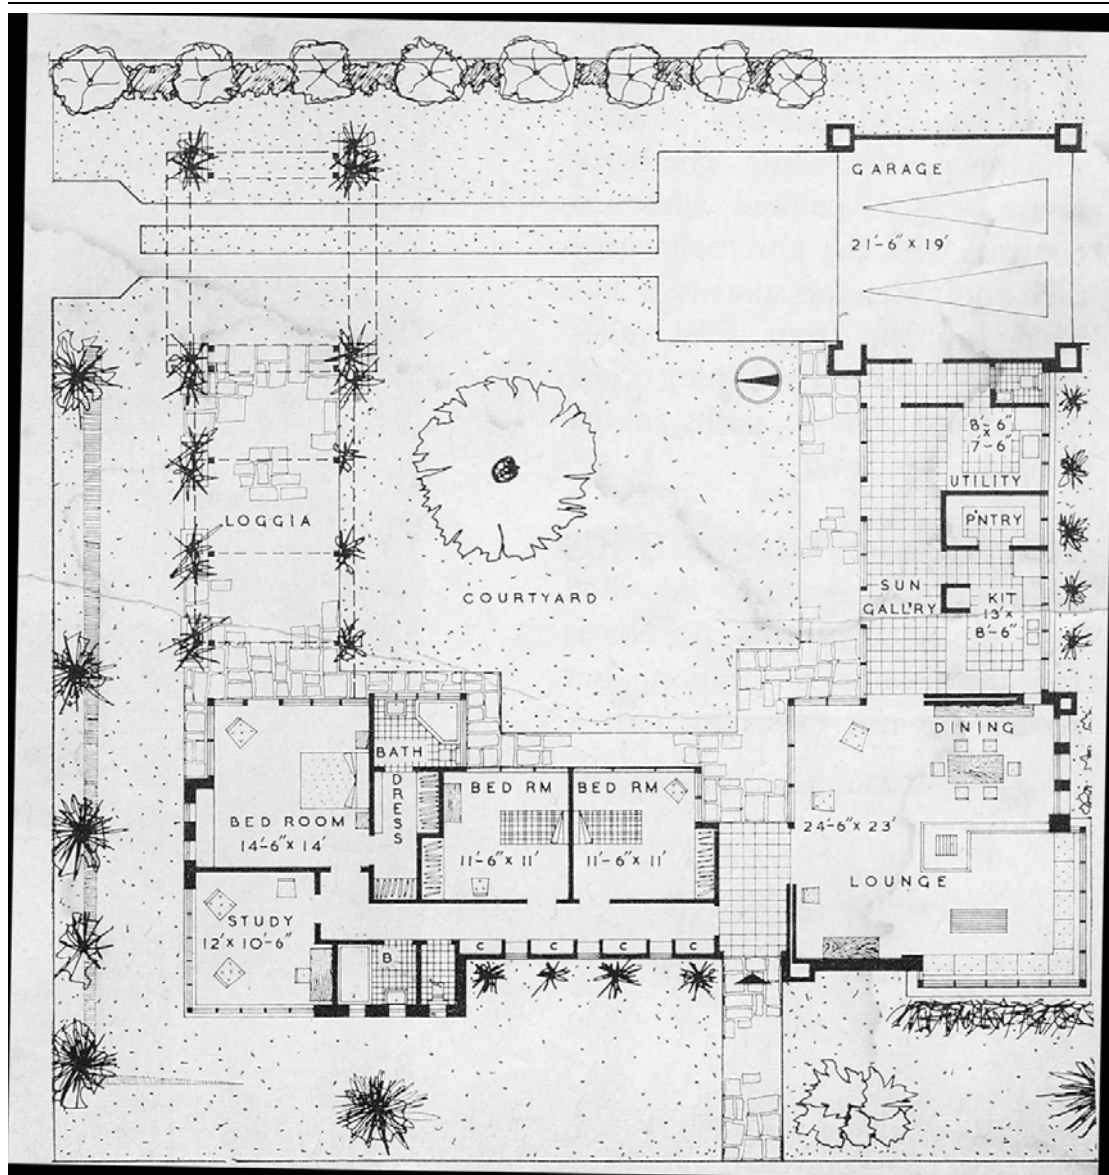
Plan of Building 2 wirra Close, St., Ives B. Robertson, Robertson & Hindmarsh c.1962
